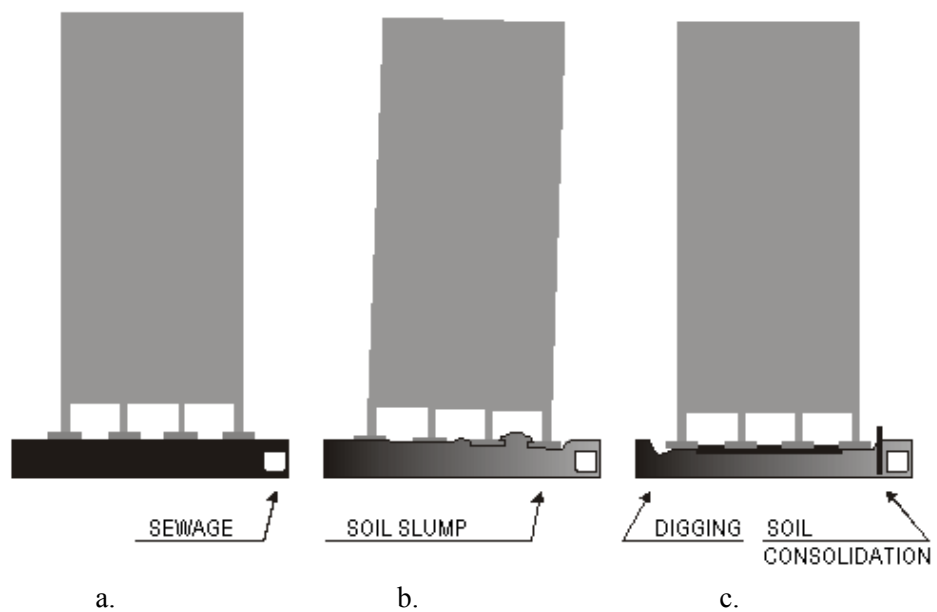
Failure of foundation soil due to sewage water infiltration: a. initial stage, b. soil failure, c. rehabilitated structure
